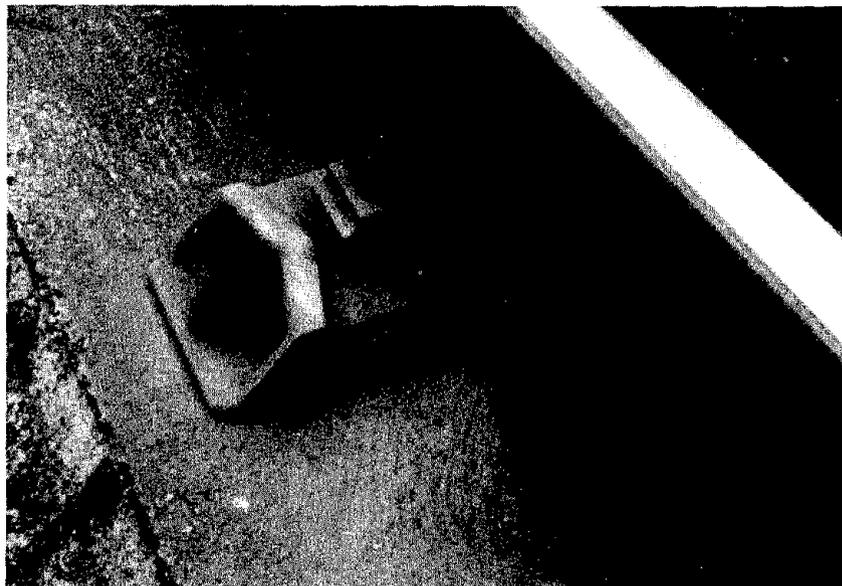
CONCRETE SLAB FASTENER AT LA GRILLERE
